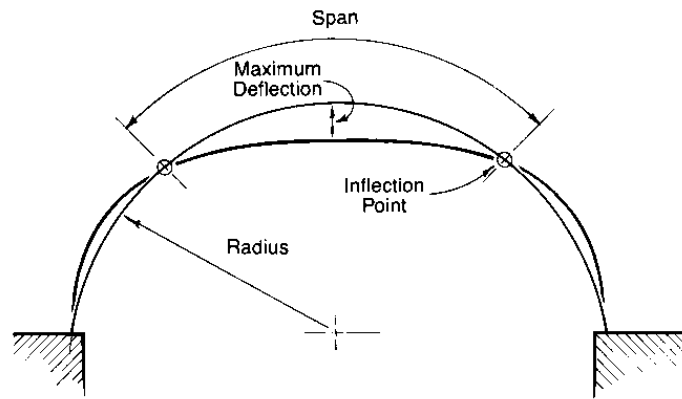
Arched Frame Deformation under Gravity Loads
